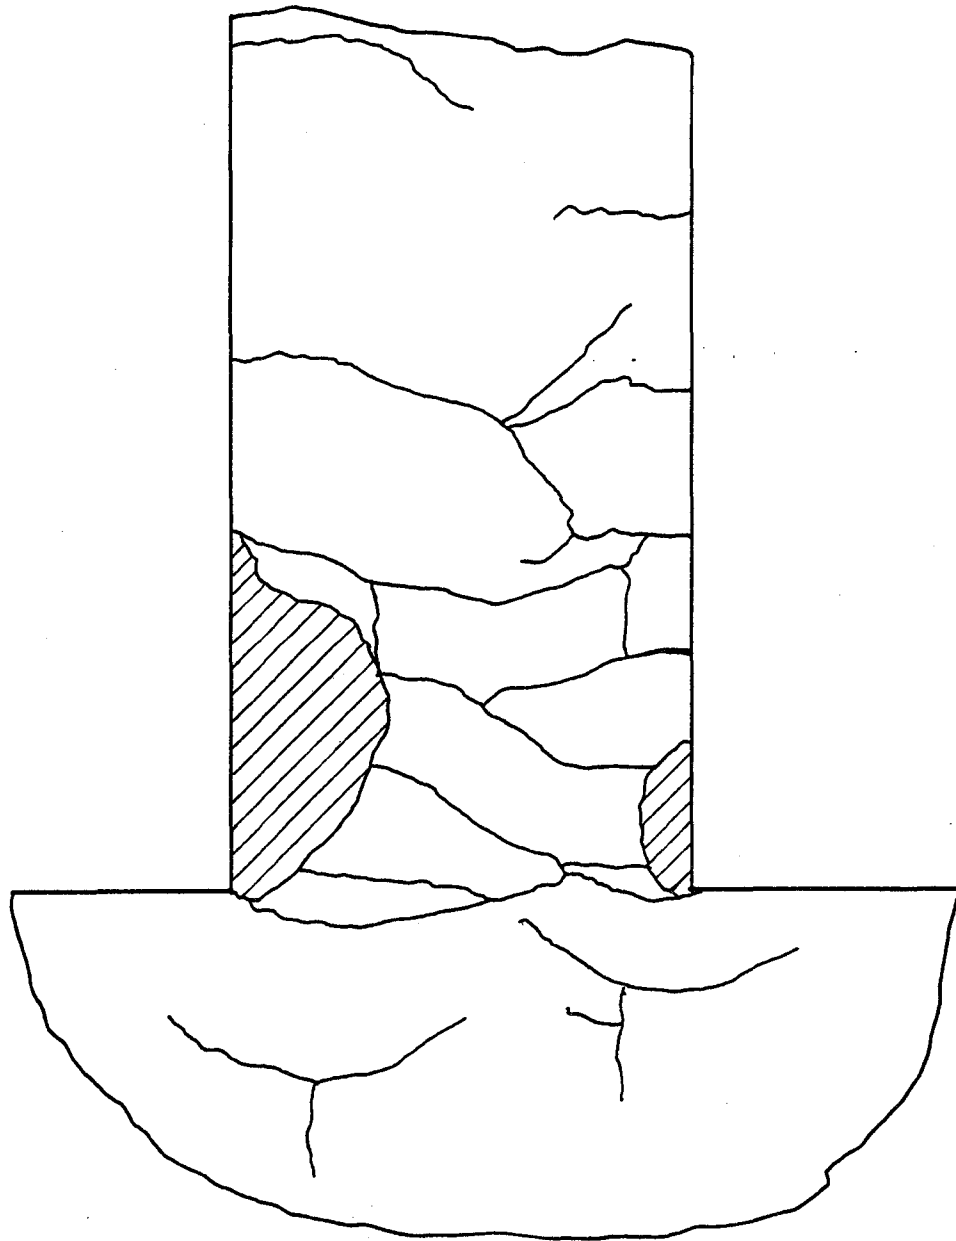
(a) Crack Pattern North Face, Specimen L4D3
